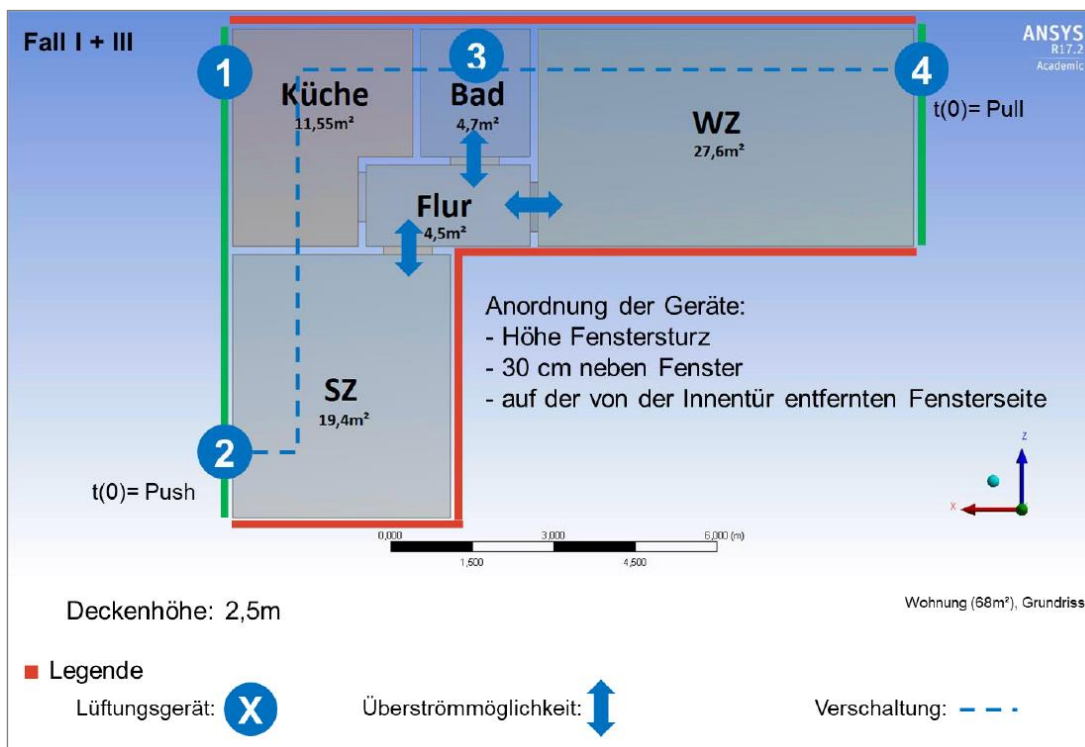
System design Case I and III for an apartment: Alternating BVU No. 2 and 4 are connected (a pair) and require an overflow between SZ (bedroom) and WZ (living room), No. 1 is a twin-unit and No.3 is an extract UVU which also requires an overflow.
